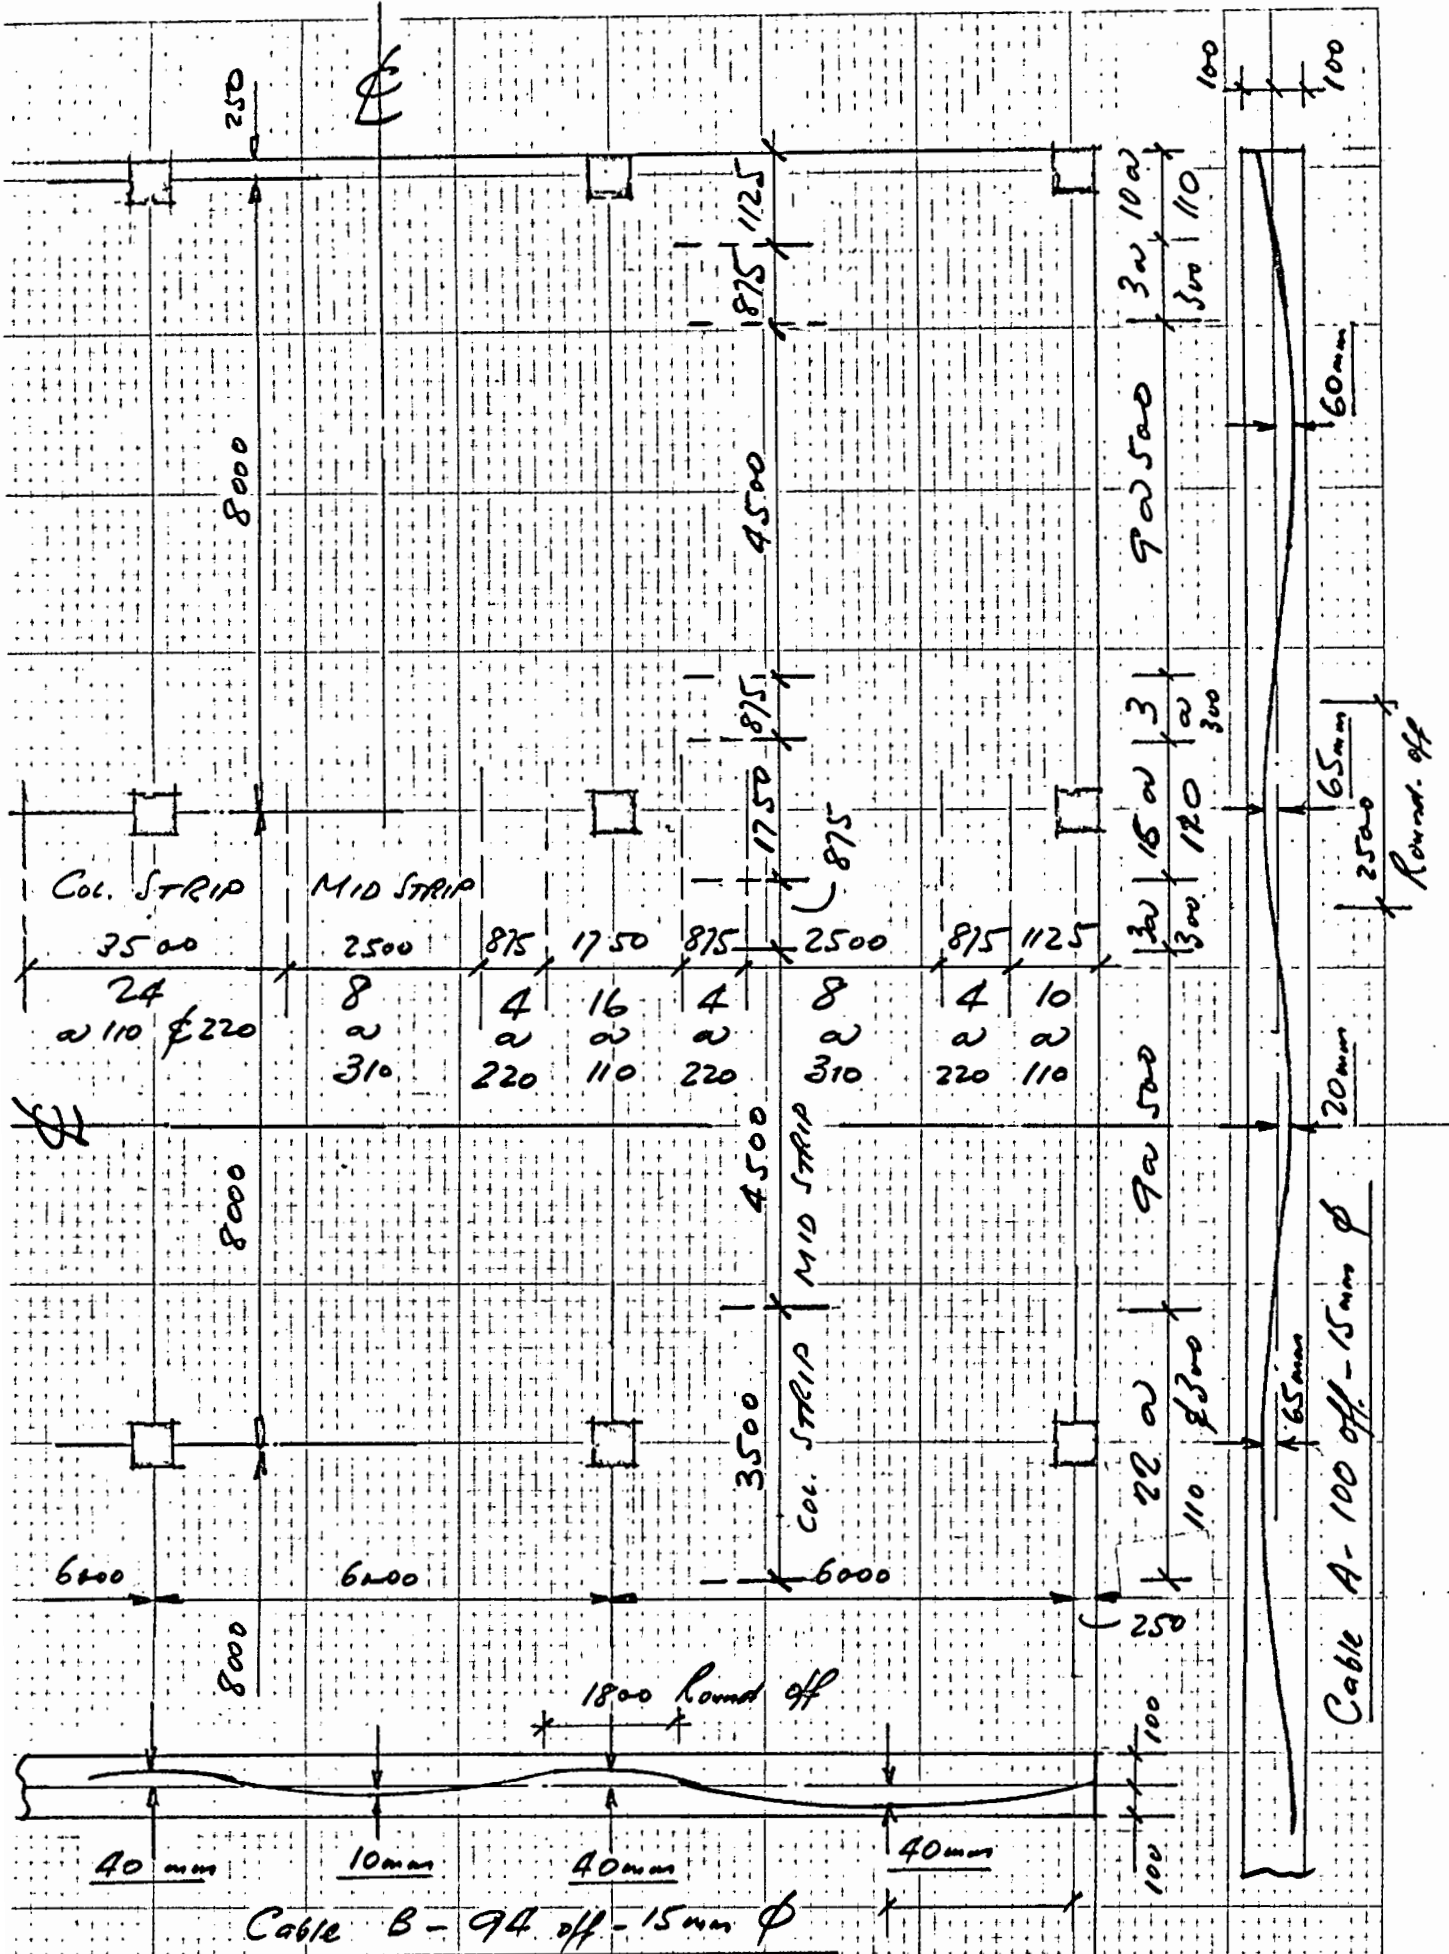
CABLE LAYOUT - 200mm PRESTRESSED PLATE F.3.2.
